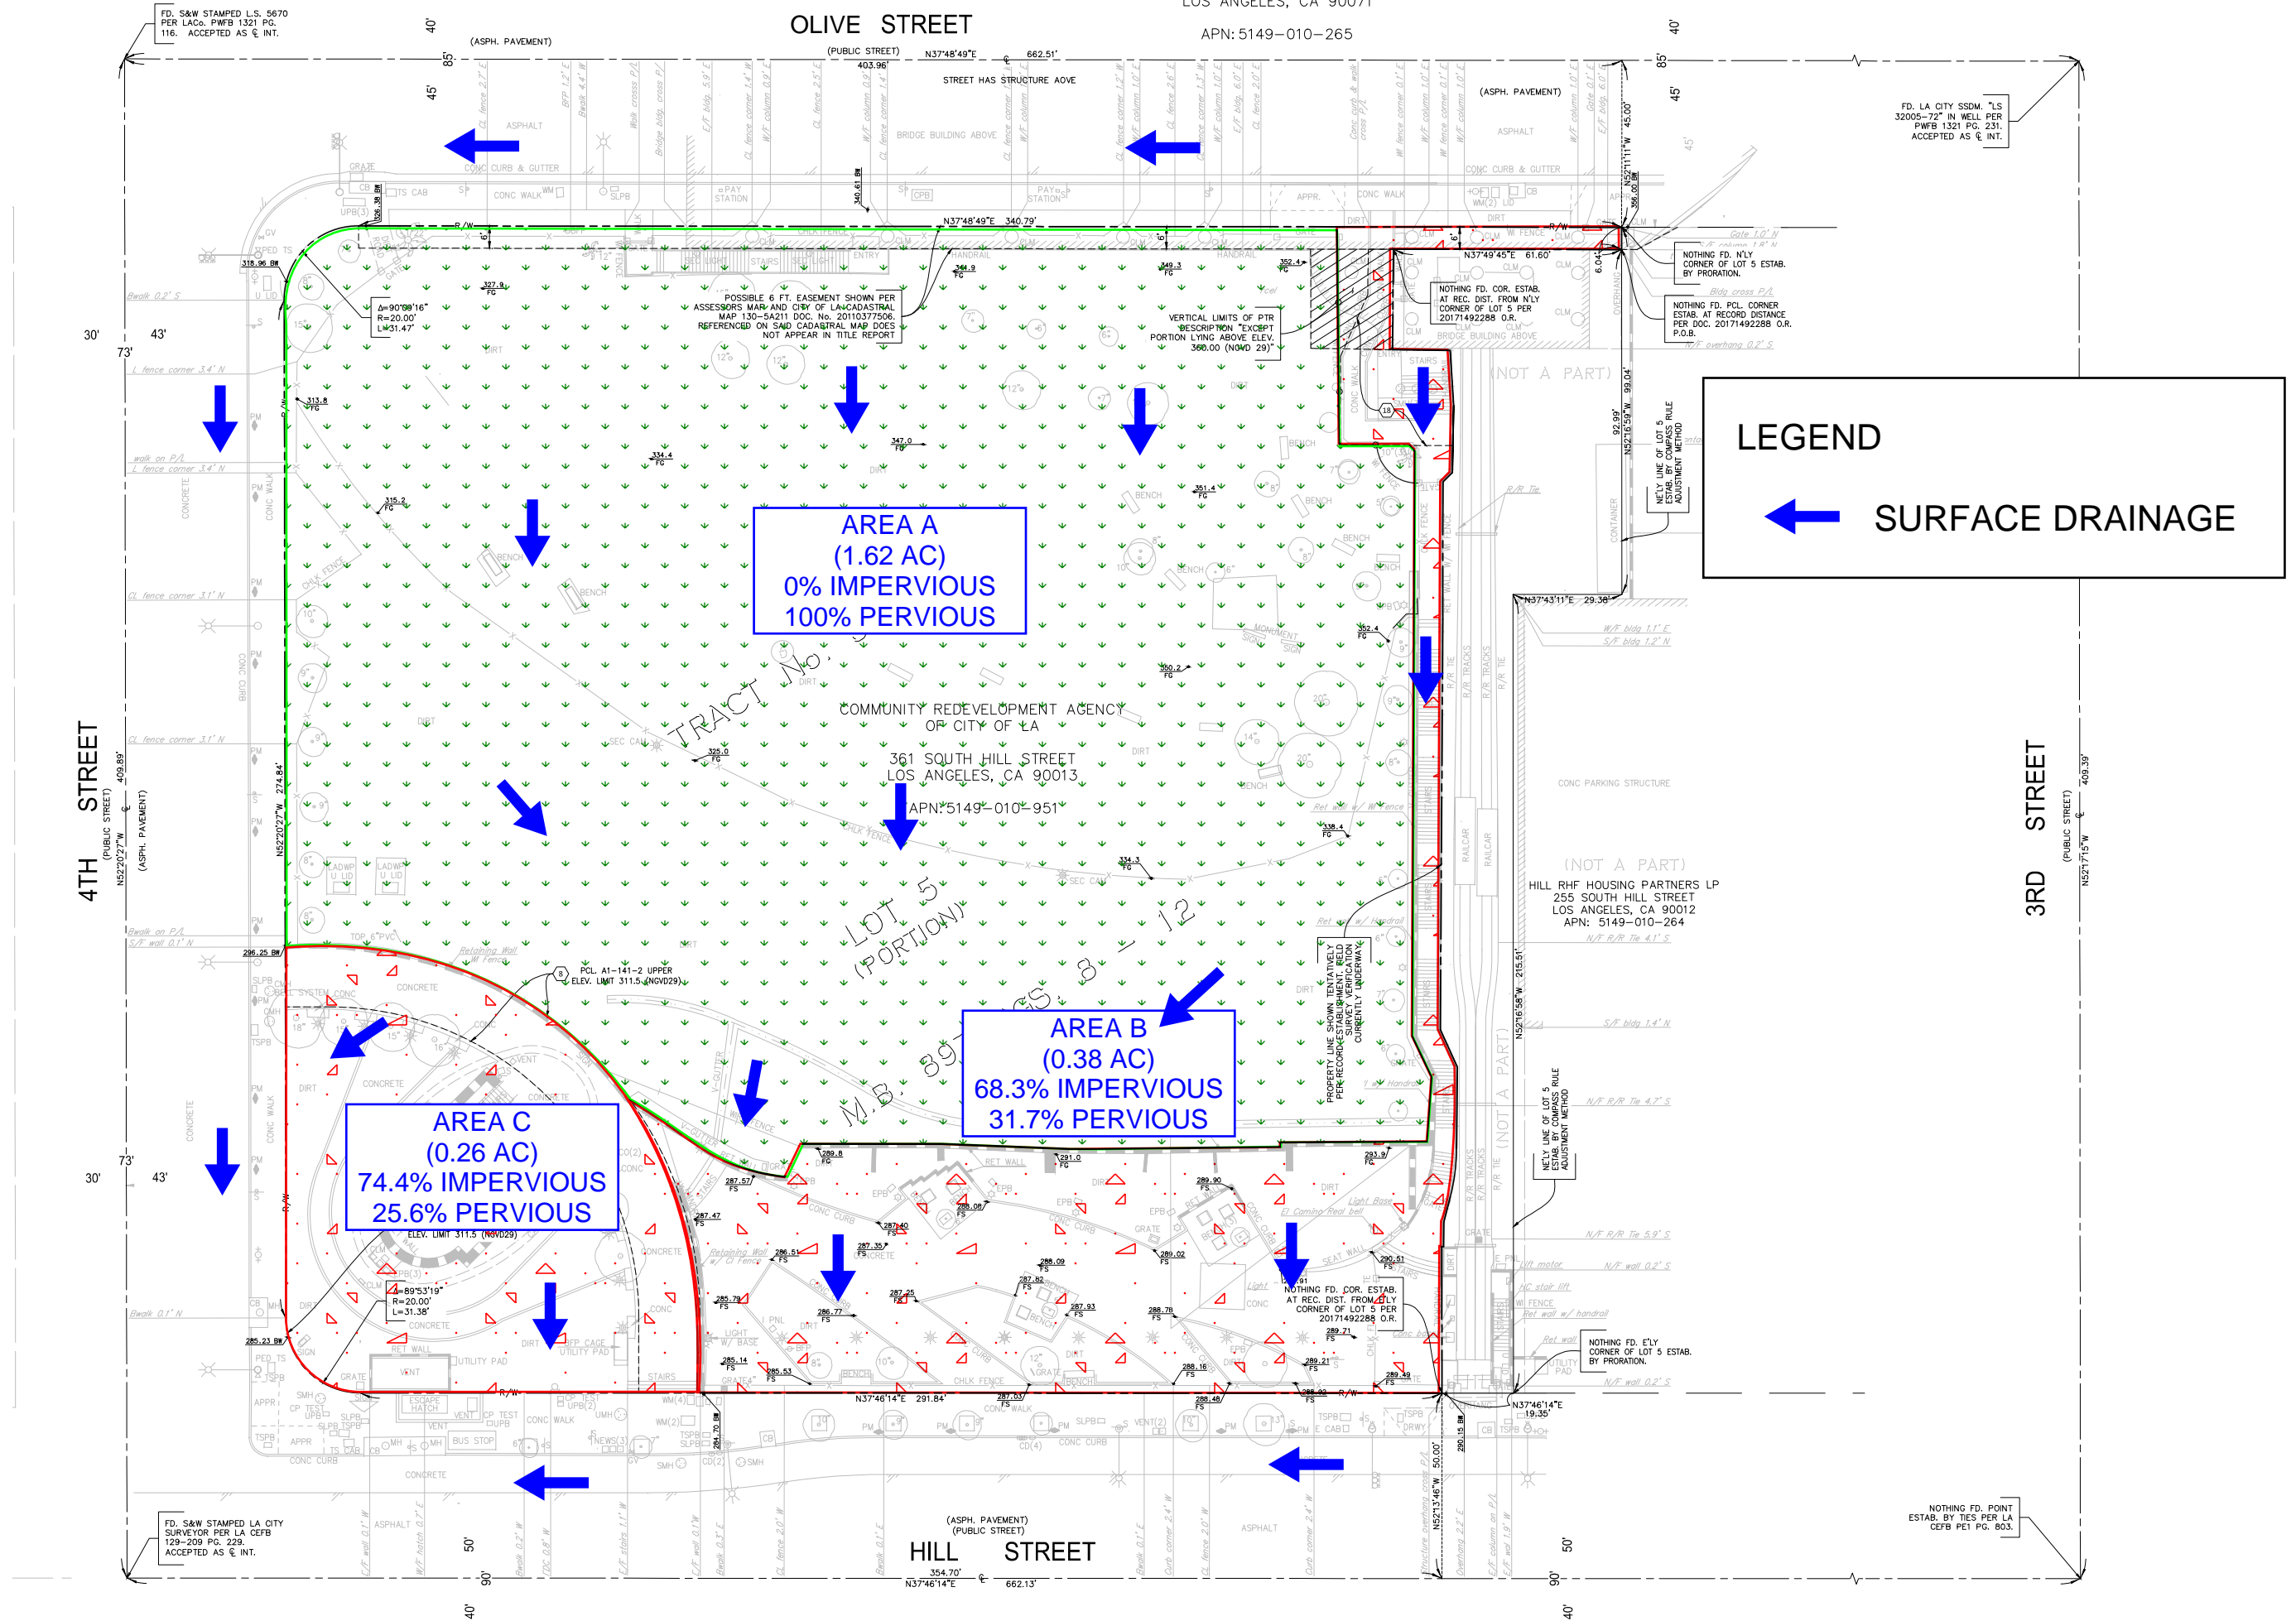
PROPOSED ON-SITE DRAINAGE
